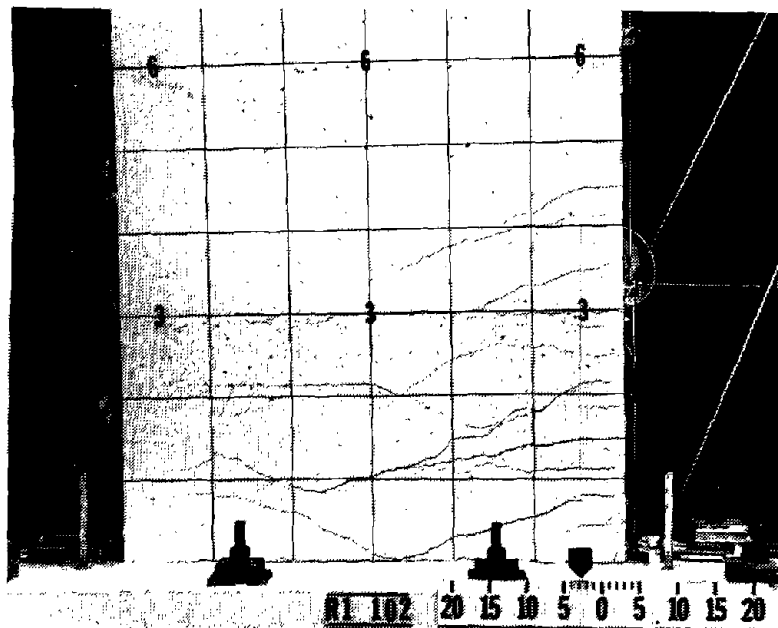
Cracking Pattern at -3 in. Deflection for Specimen R1
